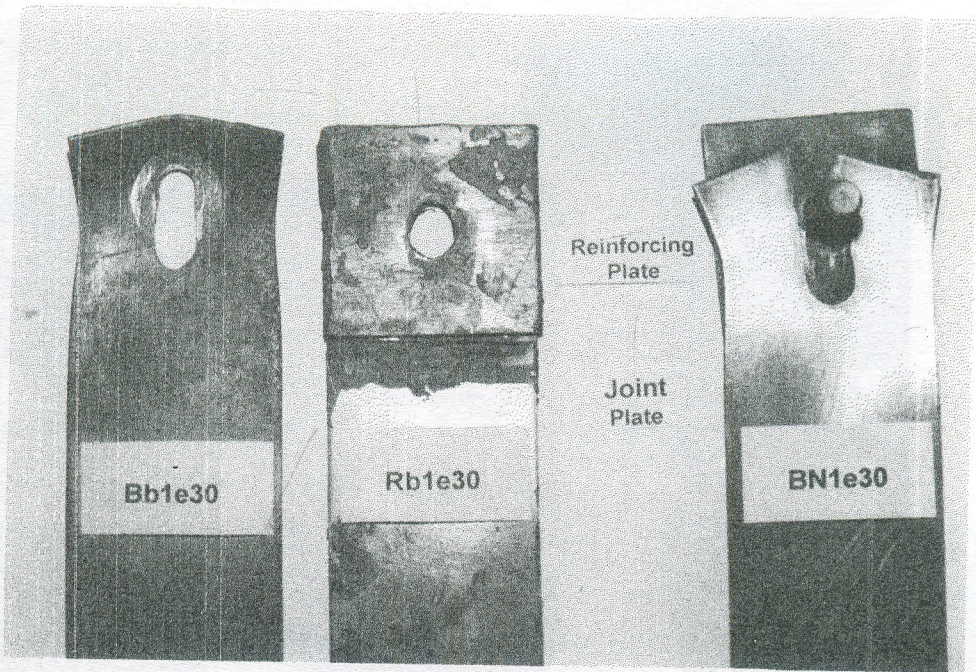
Failure of bolted and reinforced joints with single bolt.
